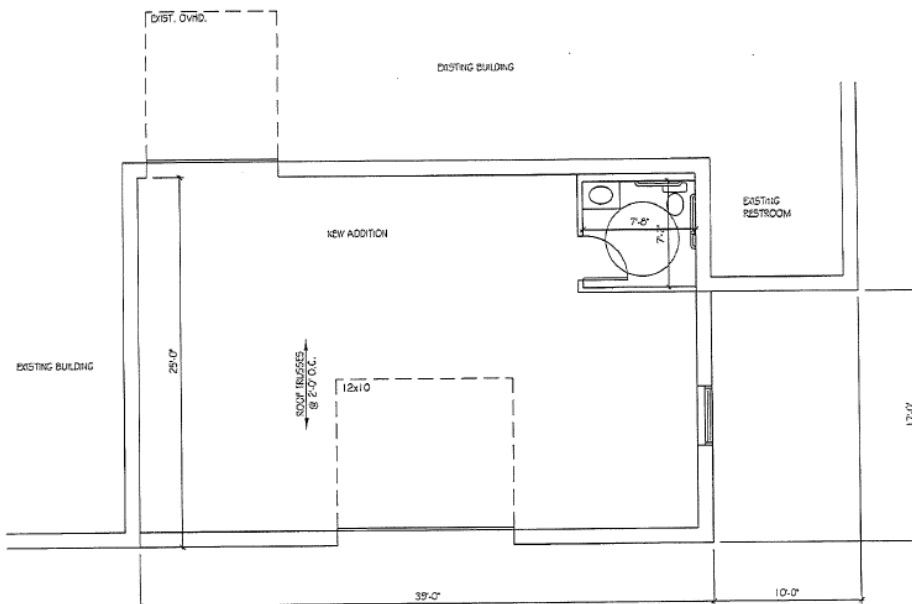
Interior Layout of Proposed New Addition to Subject Property.
